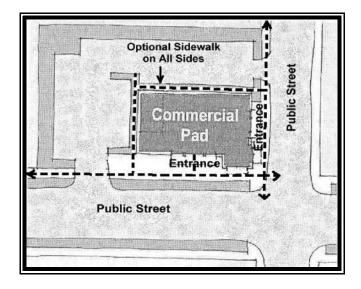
Exhibit F: Single Commercial Pad Site Pedestrian Facilities
